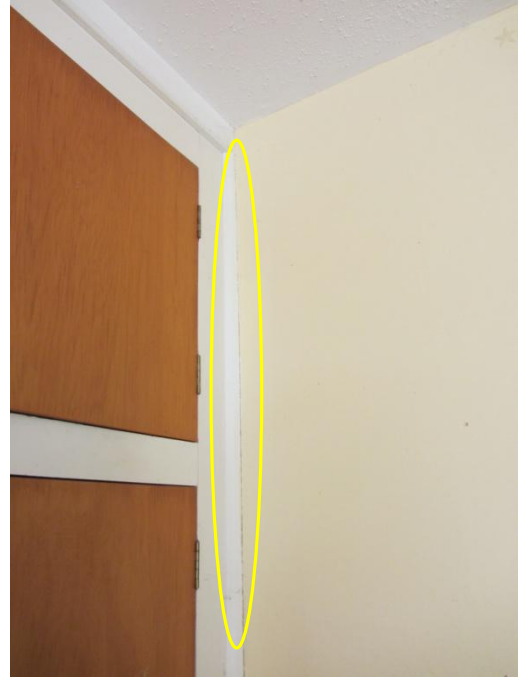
Cracking along Wardrobe Architrave and Wall Lining Joint
